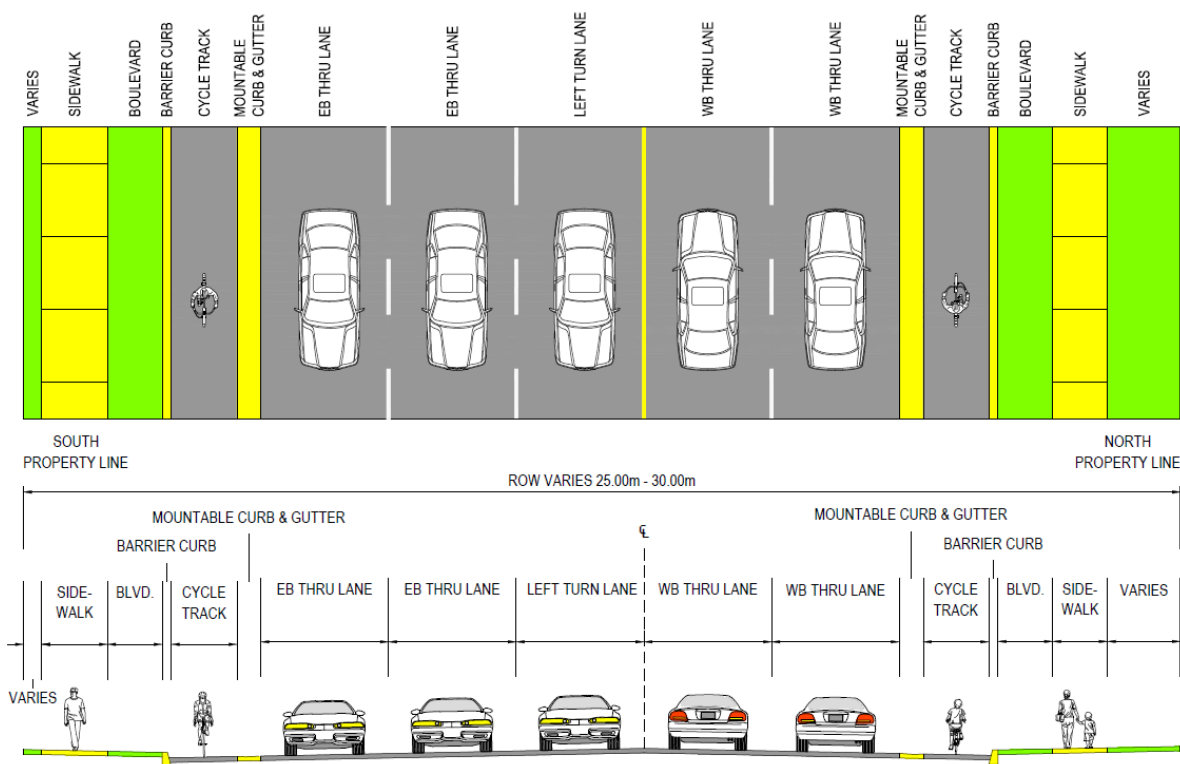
Alternative 2C (Modified) – Beechwood Drive/Gateview Drive to Erbsville Court
